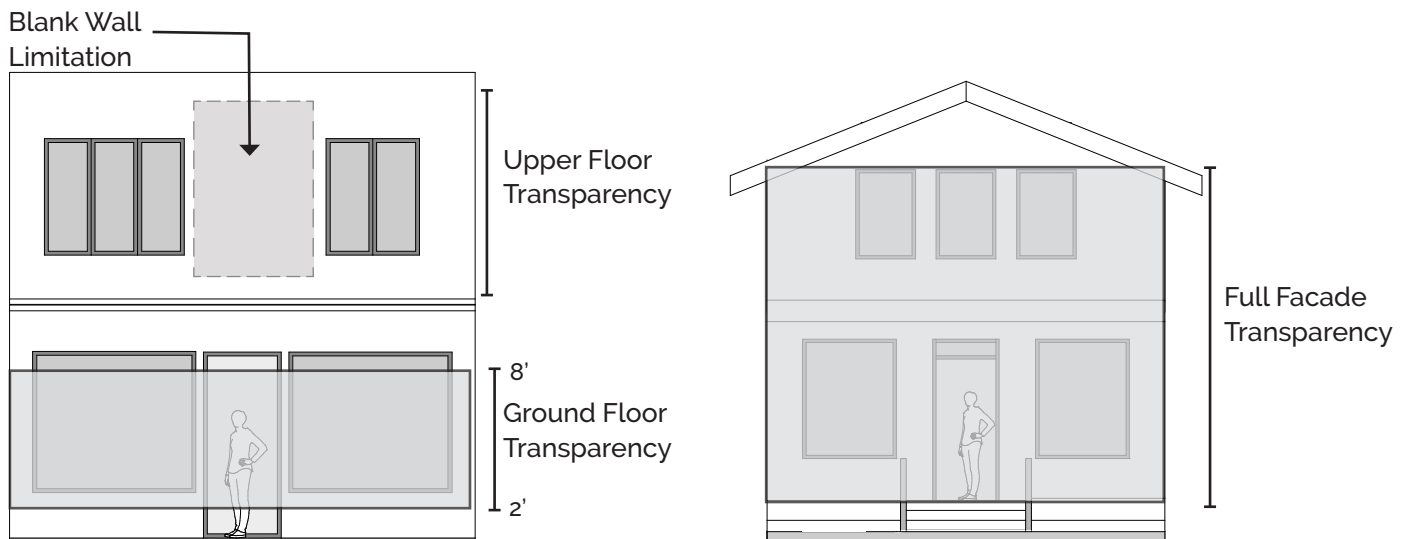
Measuring Transparency: Ground Floor, Upper Floor, & Full Facade
